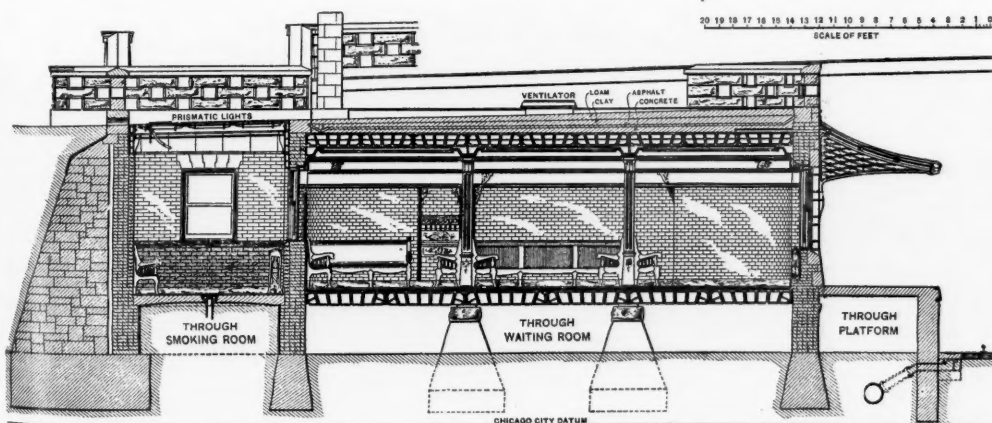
Transverse Section Van Buren Street Suburban Passenger Station (Looking North).
